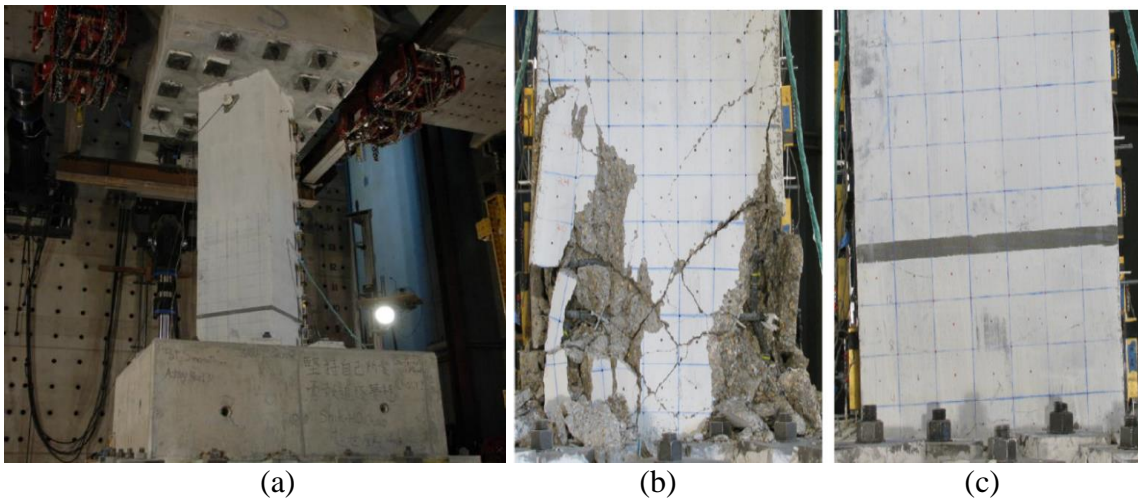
(a) UHPC specimen before testing and (b) extent of damage for RC column and (c) extent of damage for UHPC column at 5.25% drift (Chao et al., 2021)
